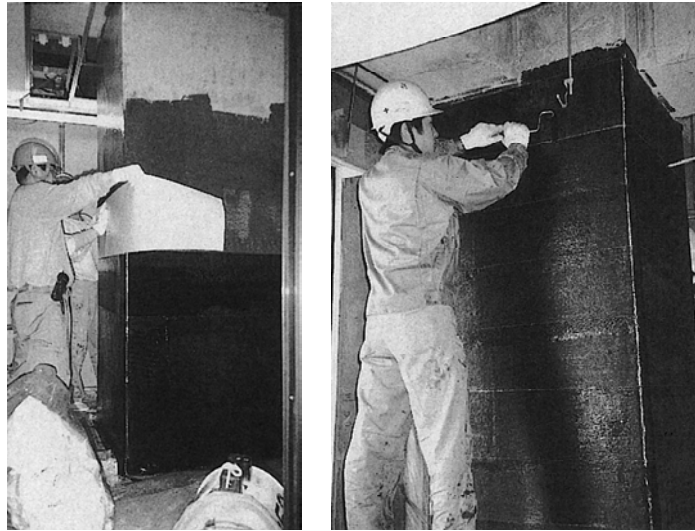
Construction Situation of Fiber Sheet Jacketing
